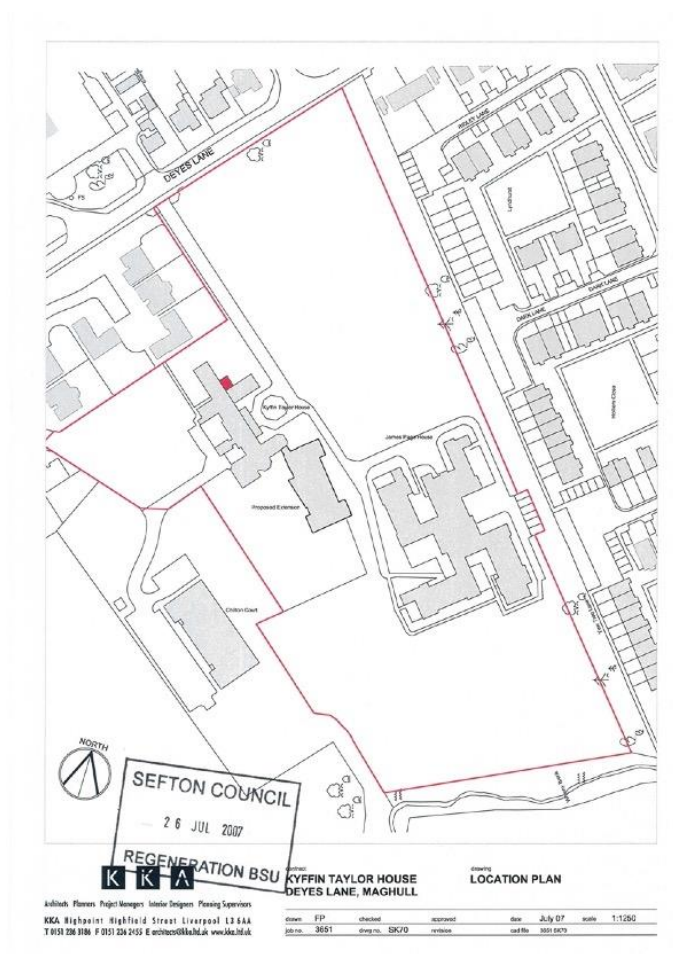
Approved Location Plan (S/2007/0730) (Source: Sefton.gov.uk)
